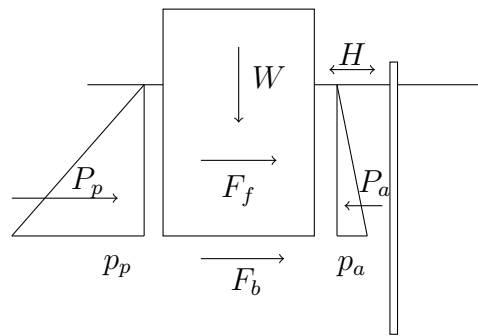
Schematic presentation of forces acting on concrete block
